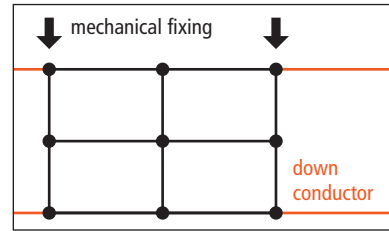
Air-termination masts spanned with cables with cross connection (meshing)
